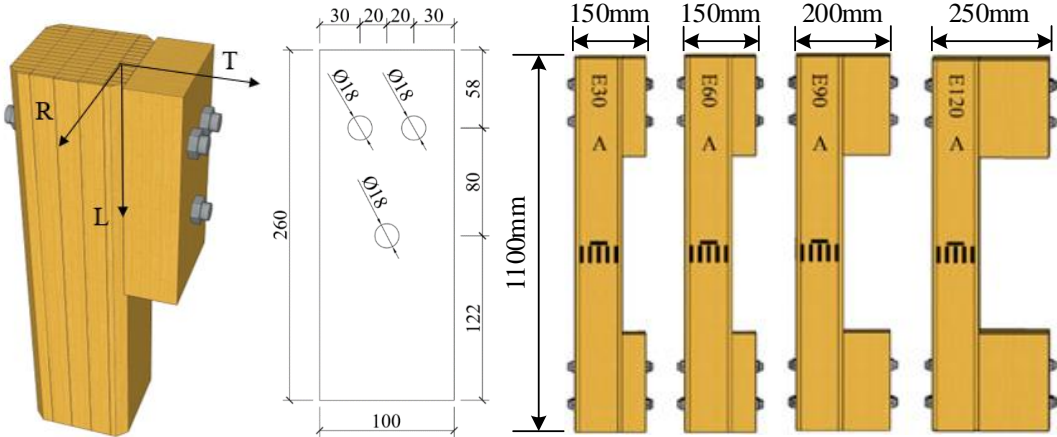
(a) Tangential eccentric direction (b) Cross section and dimension of bracket (c) Dimension of columns
